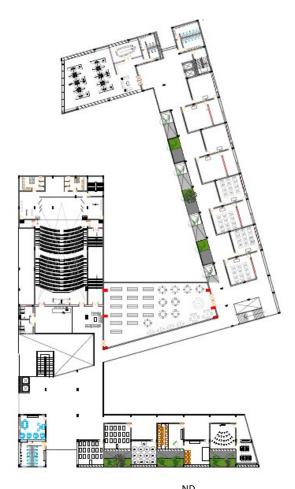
FINAL DESIGN 2<sup>ND</sup> FLOOR PLAN
